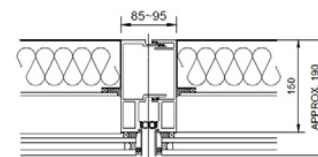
plan detail of typical vertical mullion, through spandrel zone
